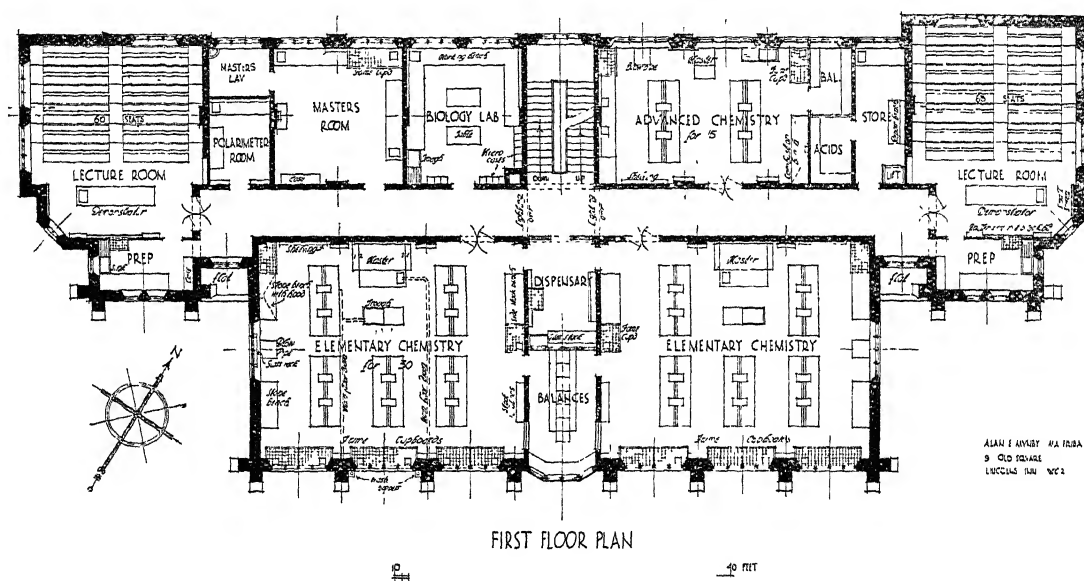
Plan of first floor of new Science School, Clifton College.
